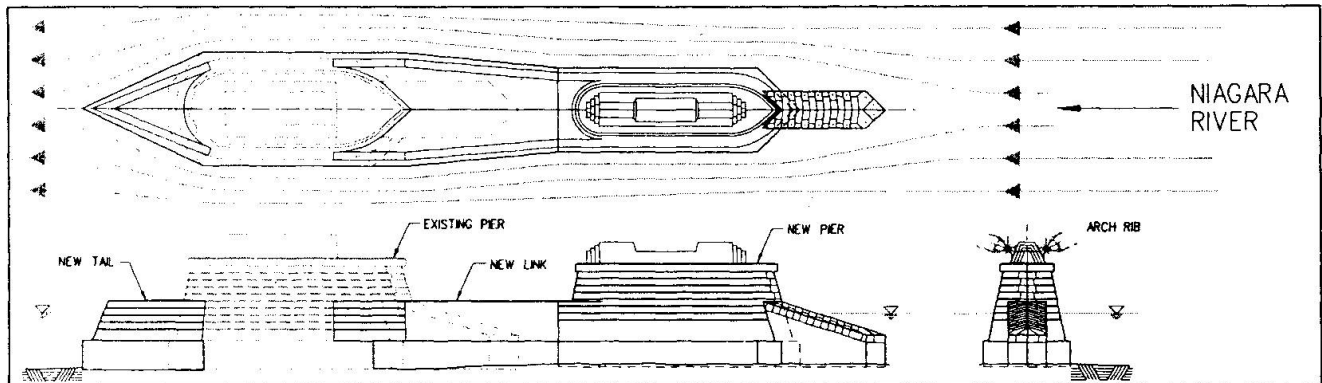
Typical River Pier, Including Link to Existing Pier and New Tail on Existing Pier
